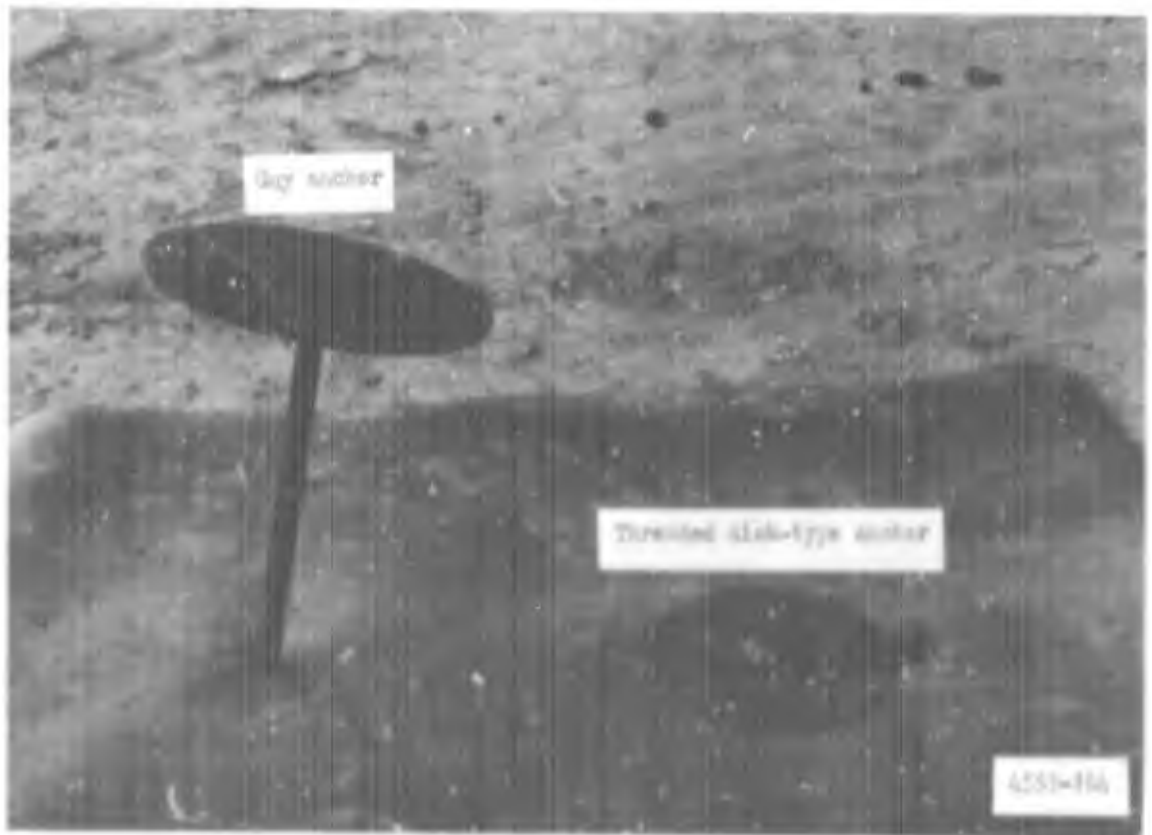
Head broken from the steel collar after the threaded guy anchor had been driven to a depth of 24 in.
